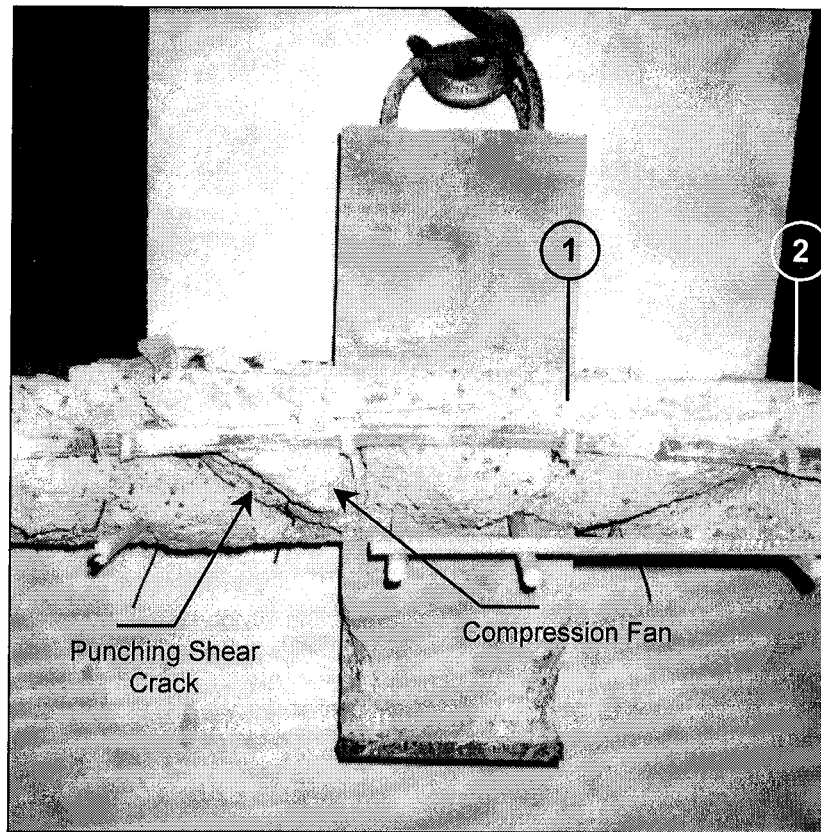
Compression Fans and Shear Crack : Slab NEF-1
